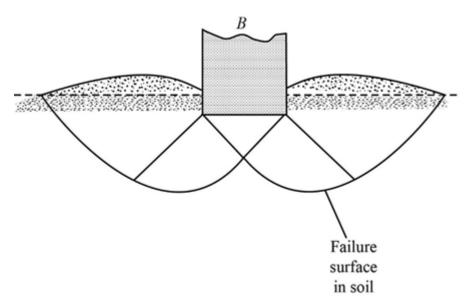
Typical Bearing Capacity Failure Surface
